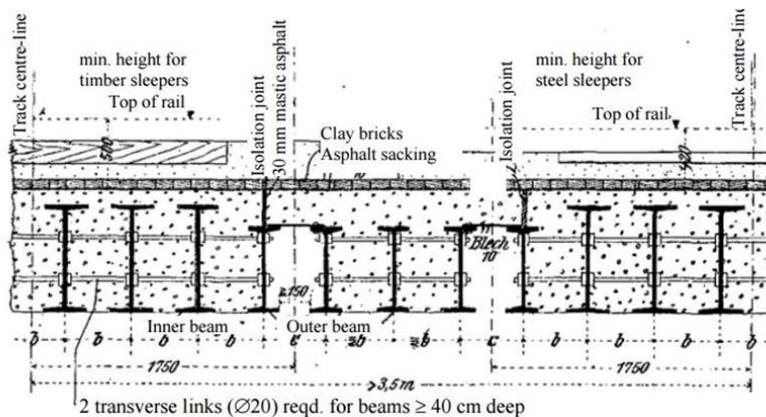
Rolled Beam Encased with Concrete, Section through Railway Bridge (Kommerell) [28]
